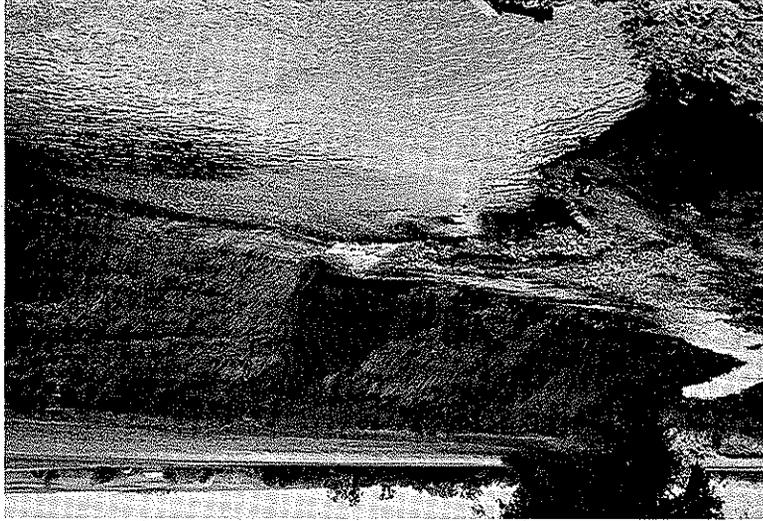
The remainder of the concrete floor and timber sidewalls of a flume which has failed, probably through piping.
